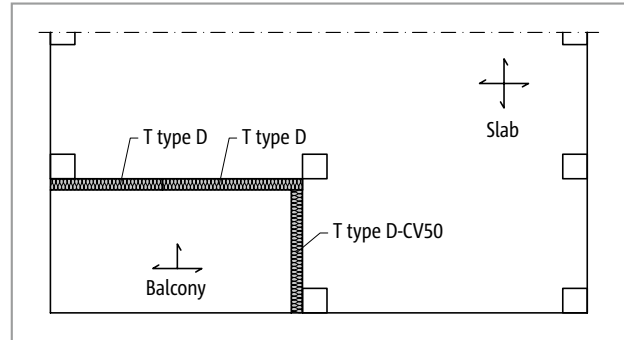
Schöck Isokorb® T type D: Two-way spanning
